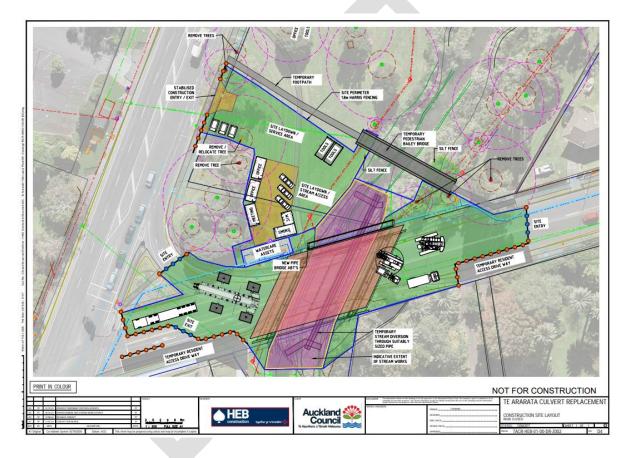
Location of bailey bridge in relation to project works along with site safety fencing (blue lines)
